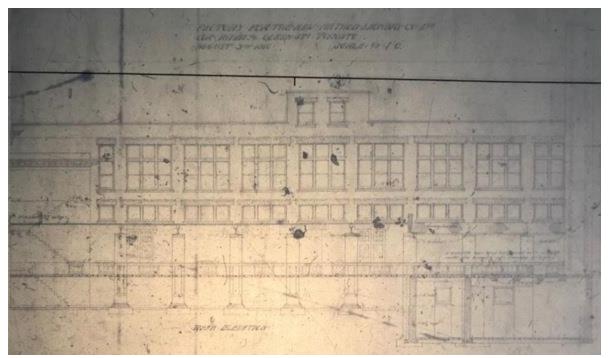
Architectural drawing (1910) of the rear elevation of the New Method Laundry building. Basement level visible.
